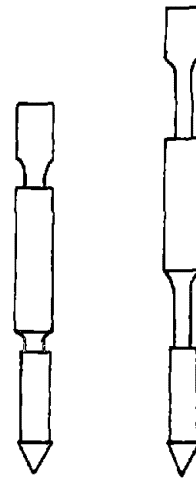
Mantle Mechanical Cone Fitted with a Side Friction Sleeve of the Begemann Type
